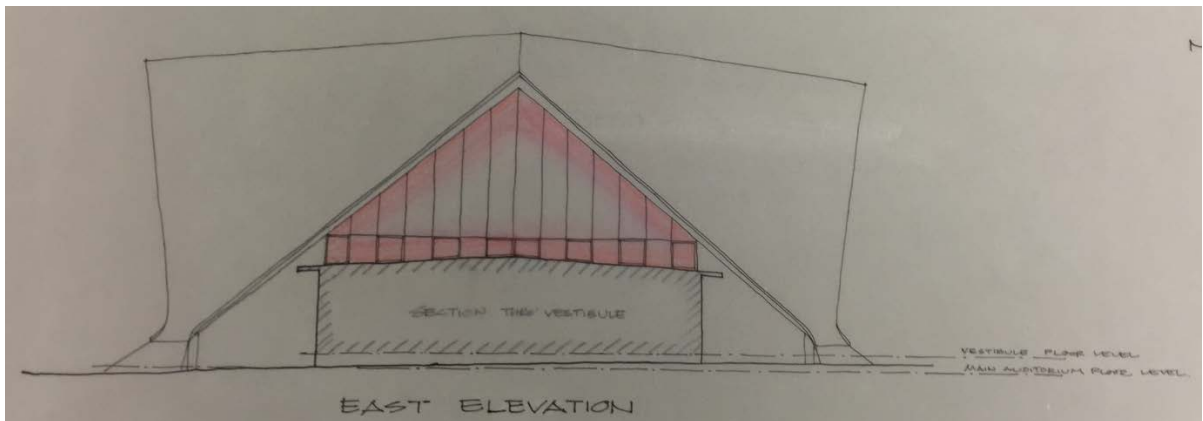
Drawing of the east elevation of the main hall building. MAC001-111-120
